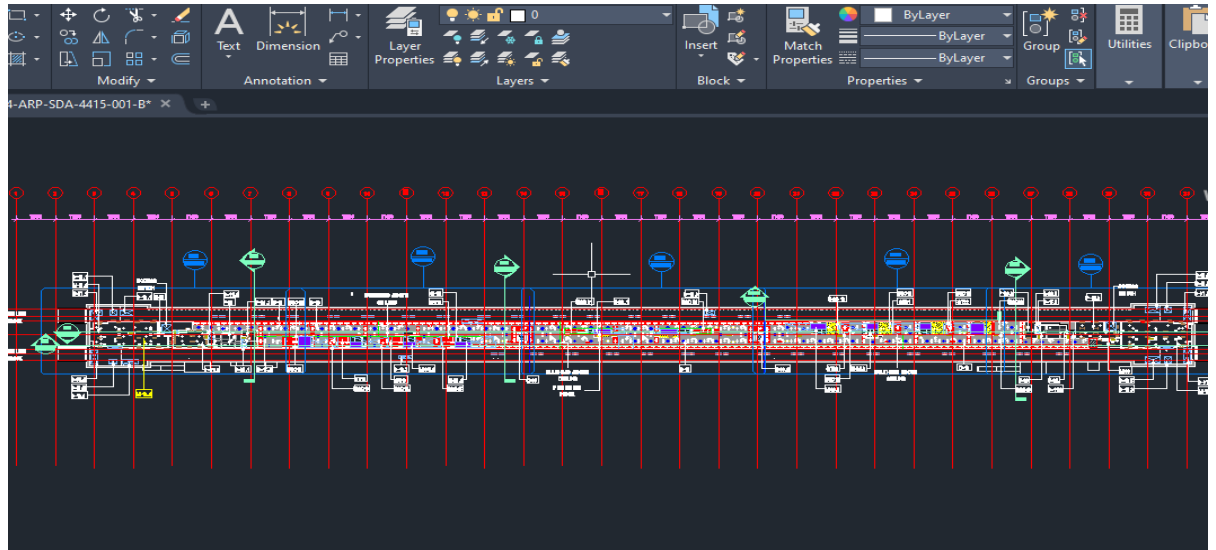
AutoCAD layout (Floor Plan) of a typical Underground Metro Station Platform Area
